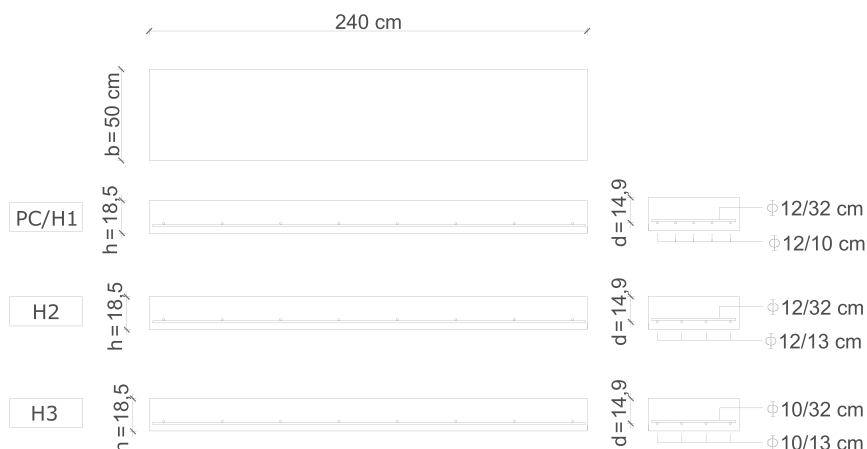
Dimensions and reinforcement plan of the specimen types
